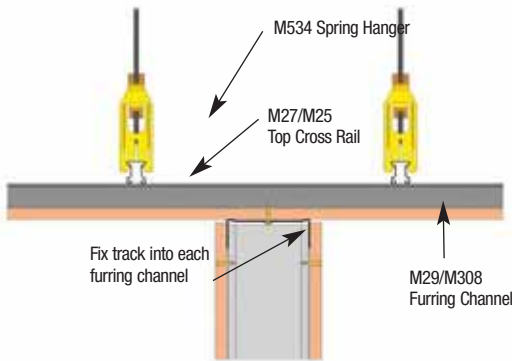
Exposed T-Bar Ceiling Connection Detail
